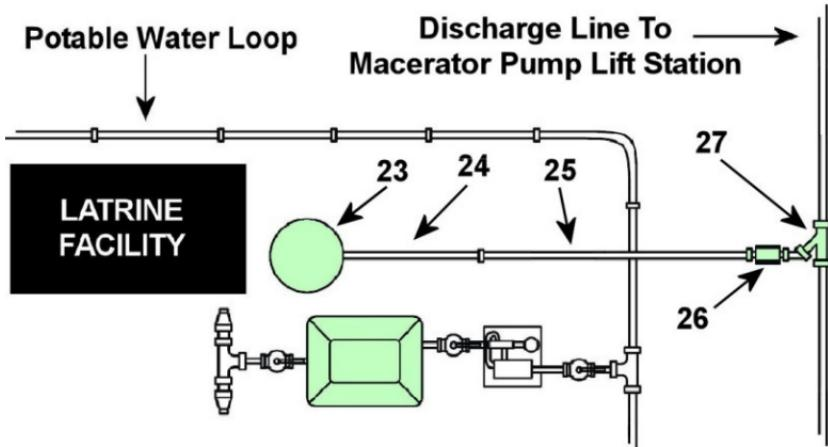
Shower and Laundry Wastewater Hose Component Layout.
